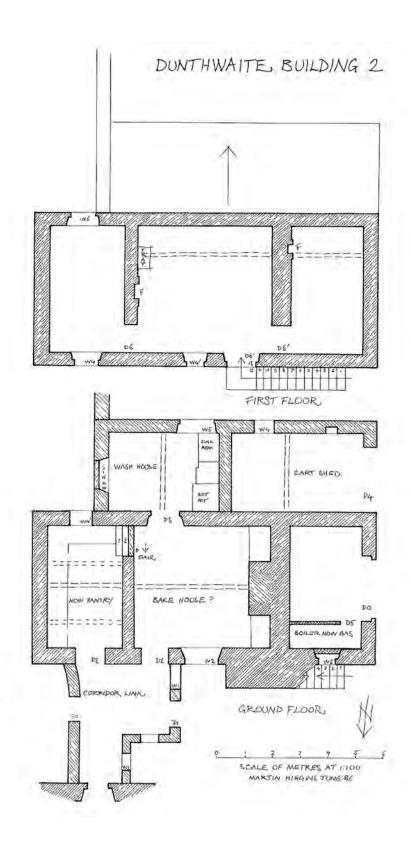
1986 survey, Building 2 ground and first floor plans (Higgins 1986).
